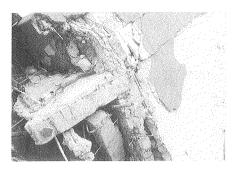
Damaged beam column joint showing beam reinforcement extensions not confined in column cage
